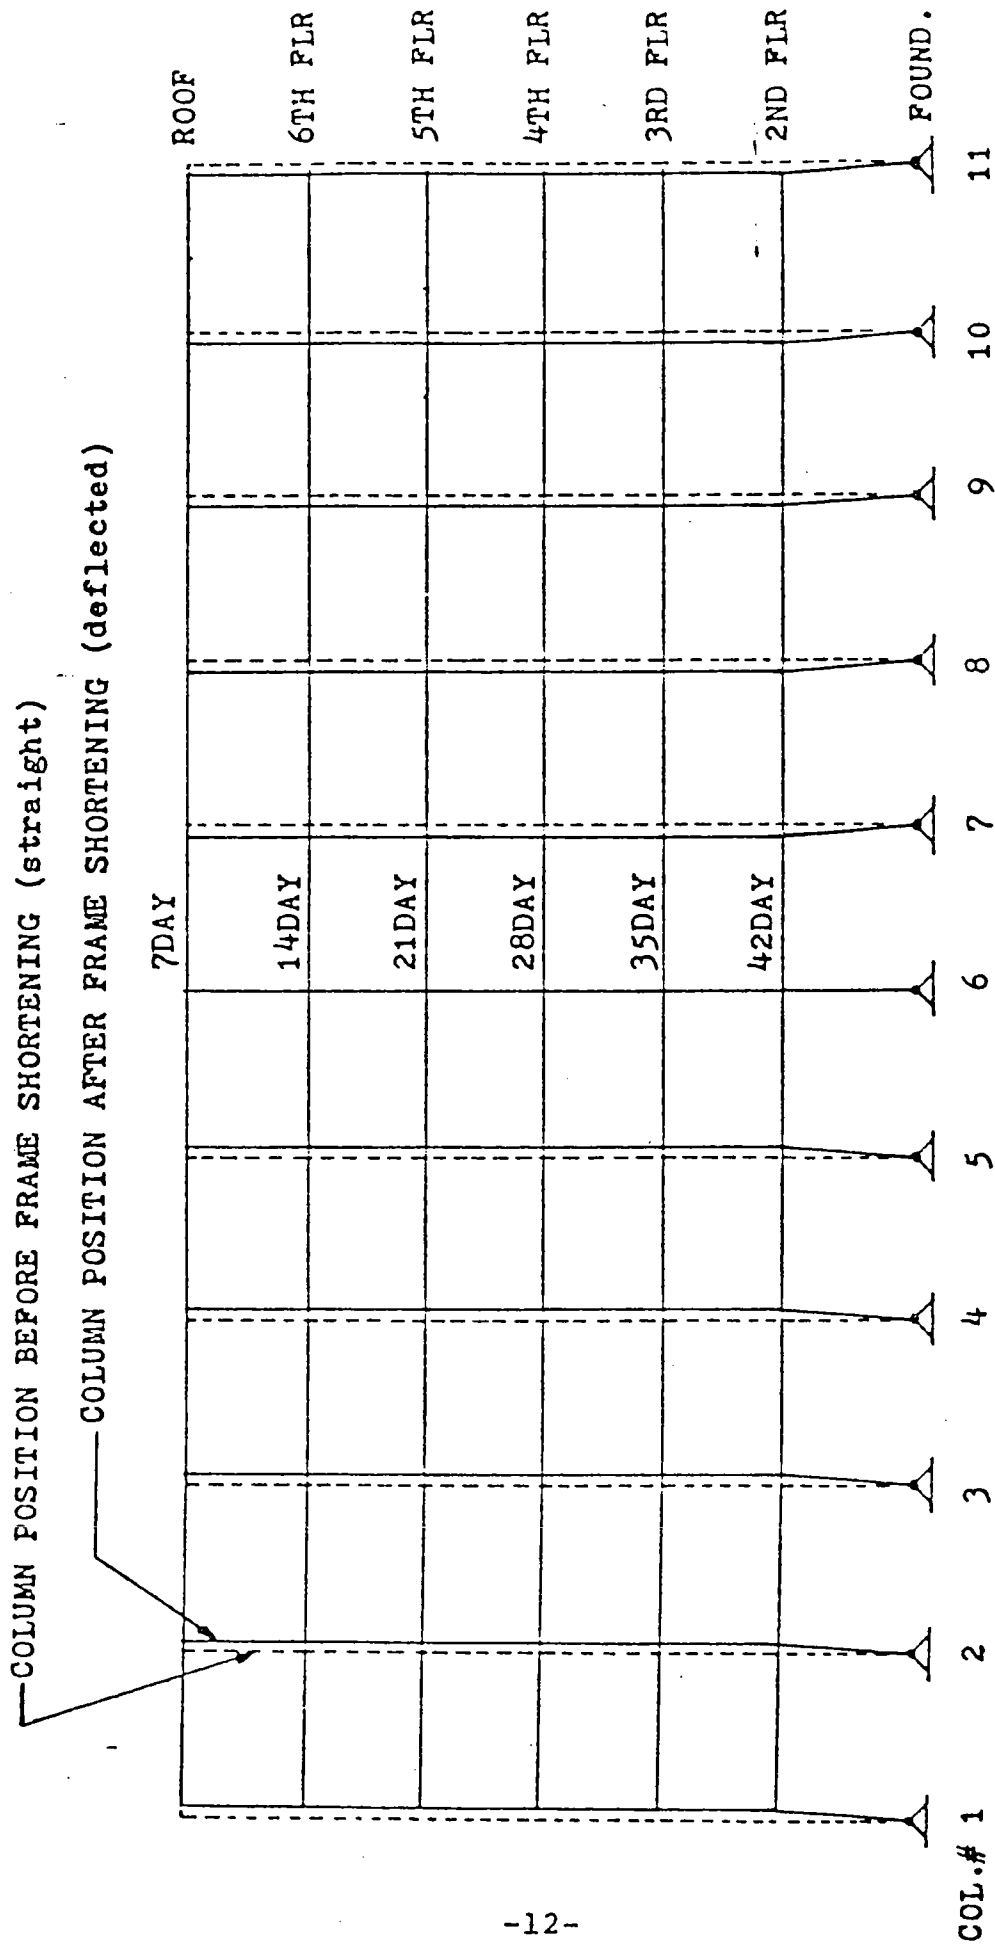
ELEVATION OF BUILDING FRAME AFTER SHORTENING HAS TAKEN PLACE
